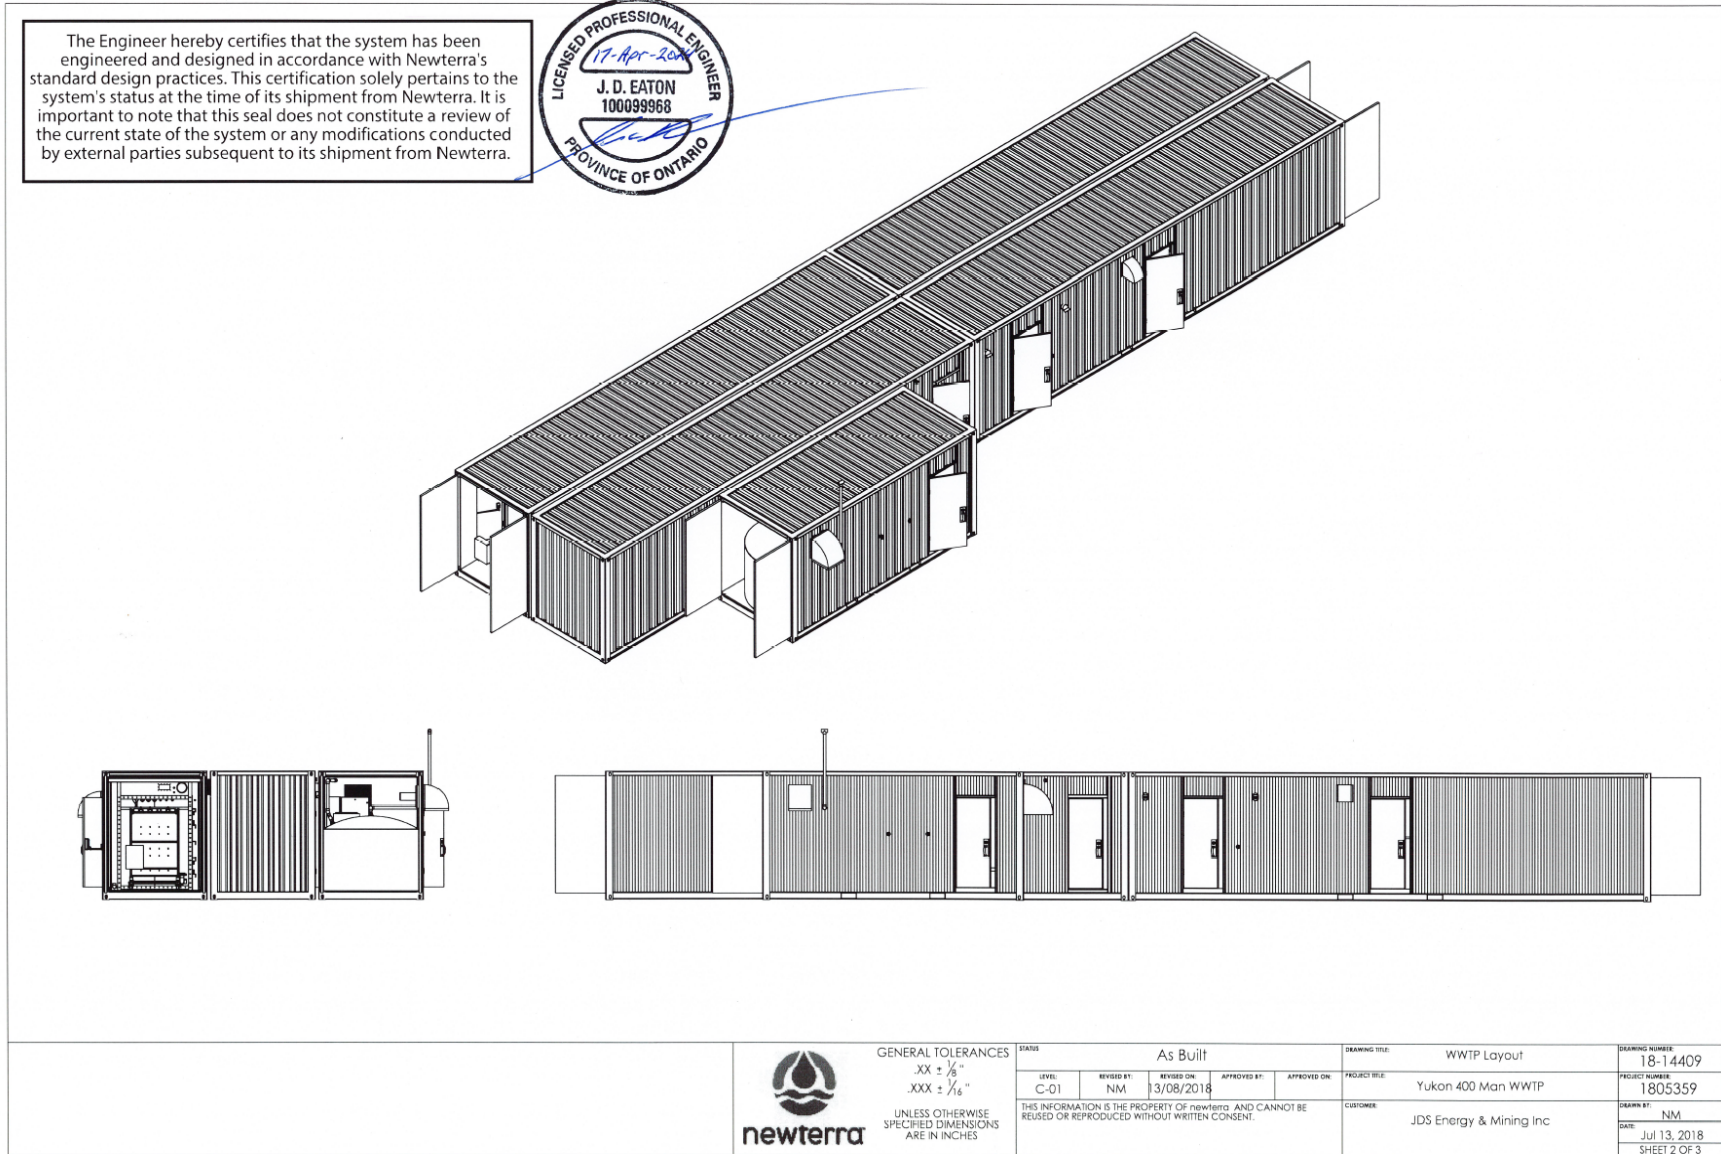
Wastewater Treatment Plant Layout (1 of 2)
